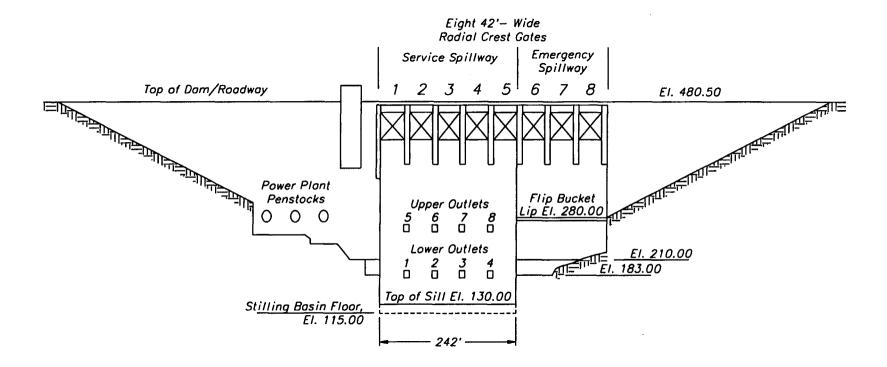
Folsom Dam's concrete gravity section viewed from downstream.
